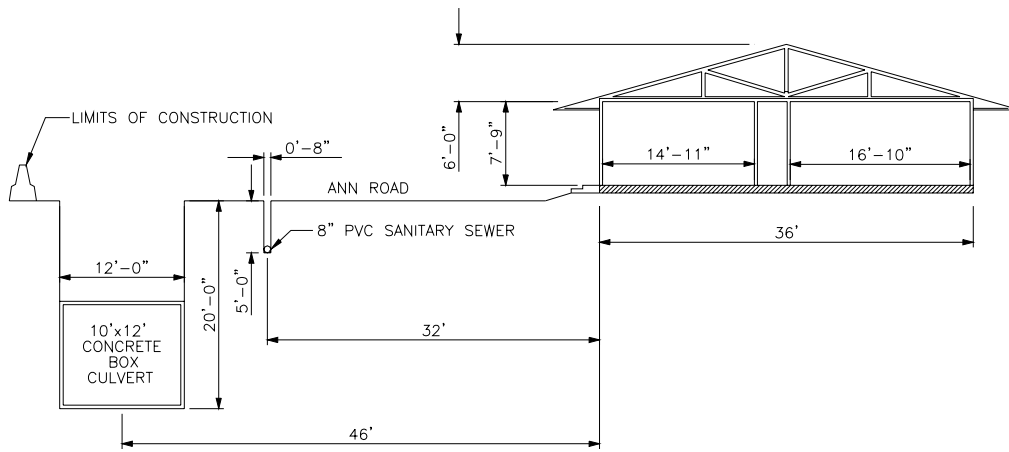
Single-story house adjacent to Ann Road Construction in Las Vegas, Nevada
